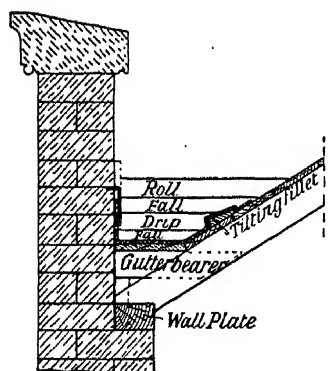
Section through a Taper Gutter behind a Parapet Wall.
